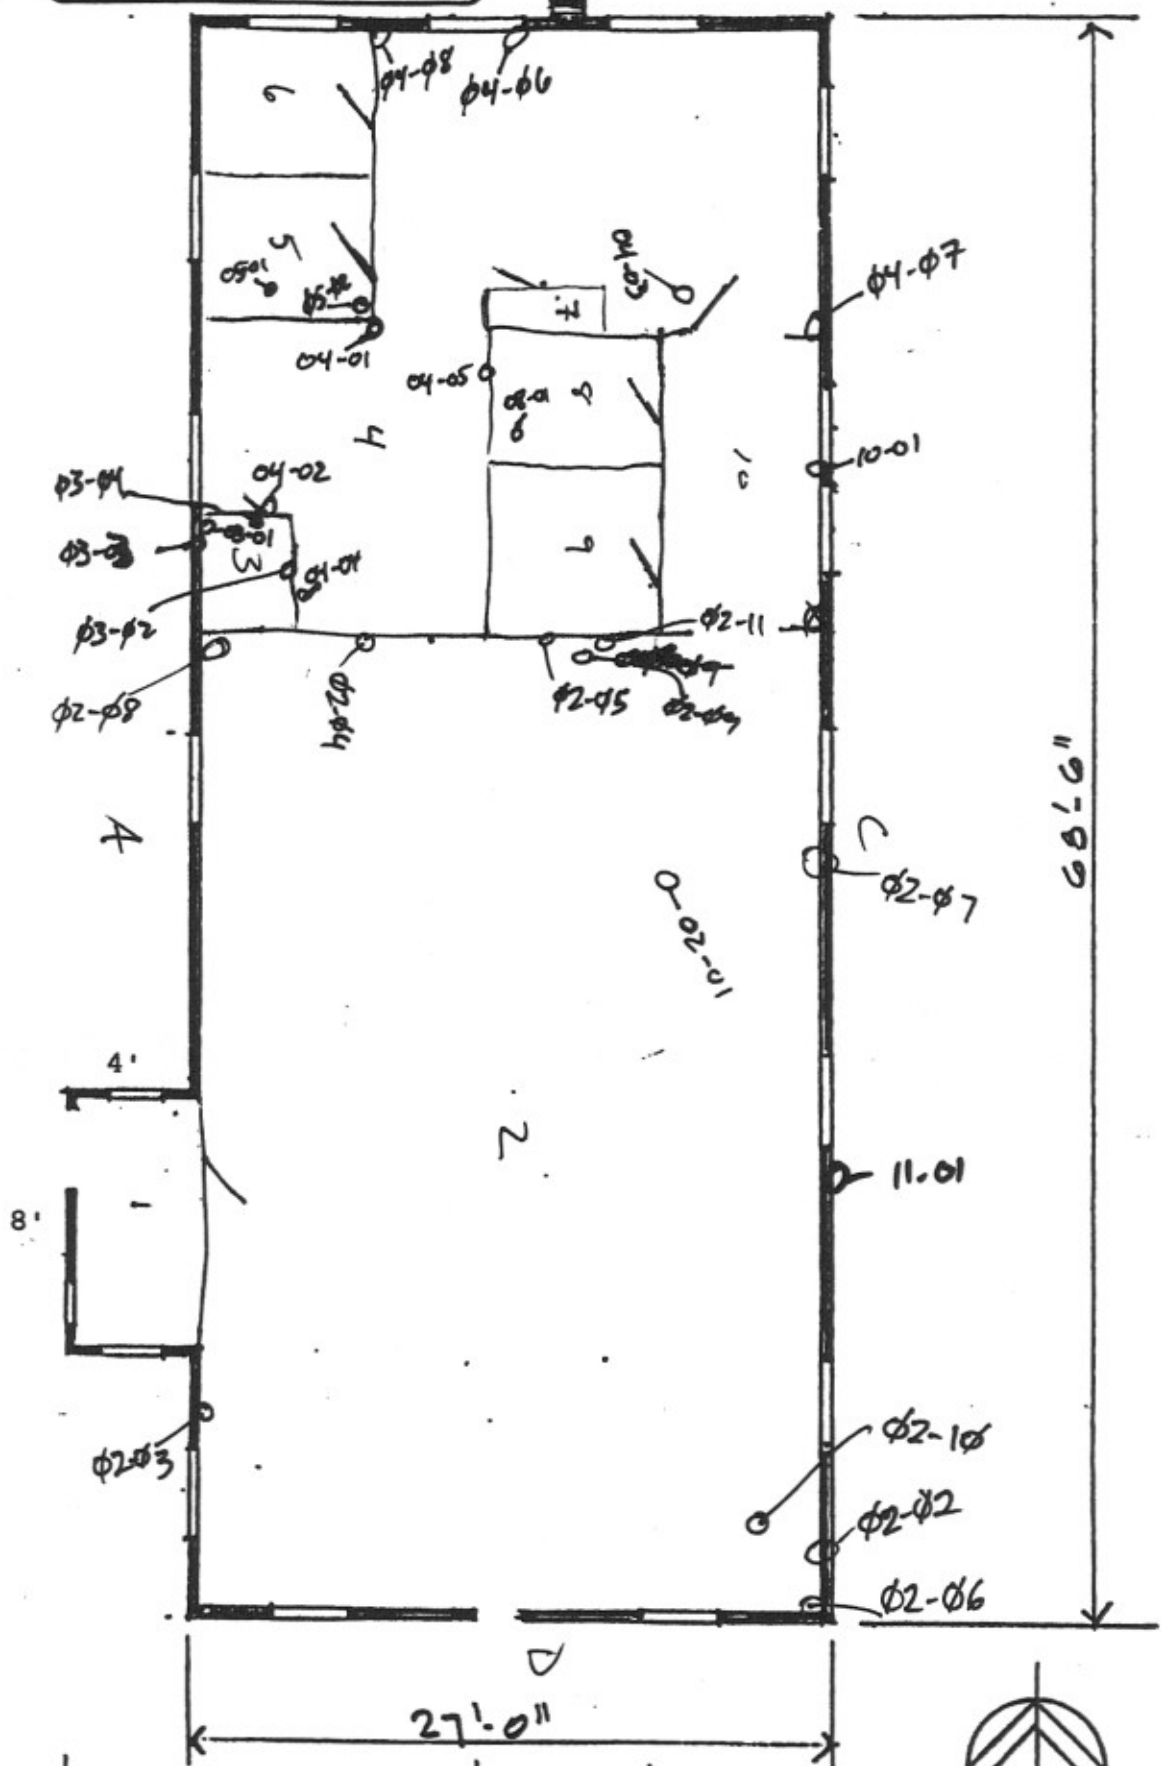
Floor Plan & Asbestos Sample Locations, Main Floor Head Start Building Scale: 1/8" = 1'-0"
